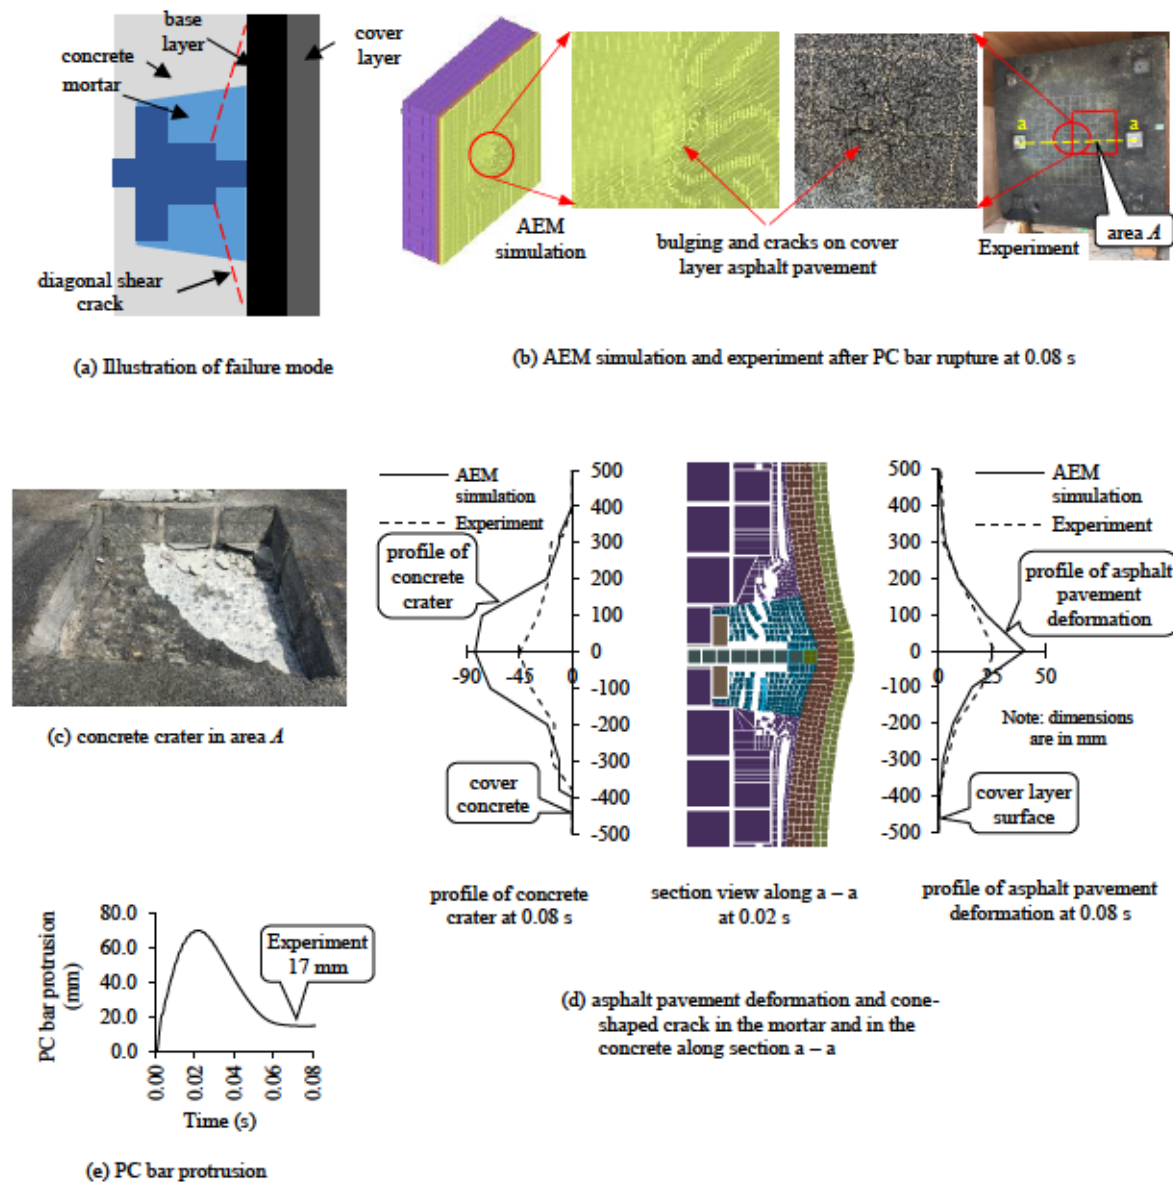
Failure modes in the asphalt pavement and in the concrete after PC bar rupture [5]
